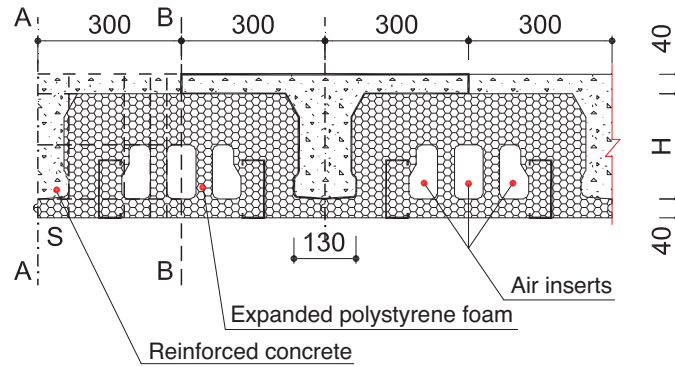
10. Roof structure of the system «Dobeles panelis»
